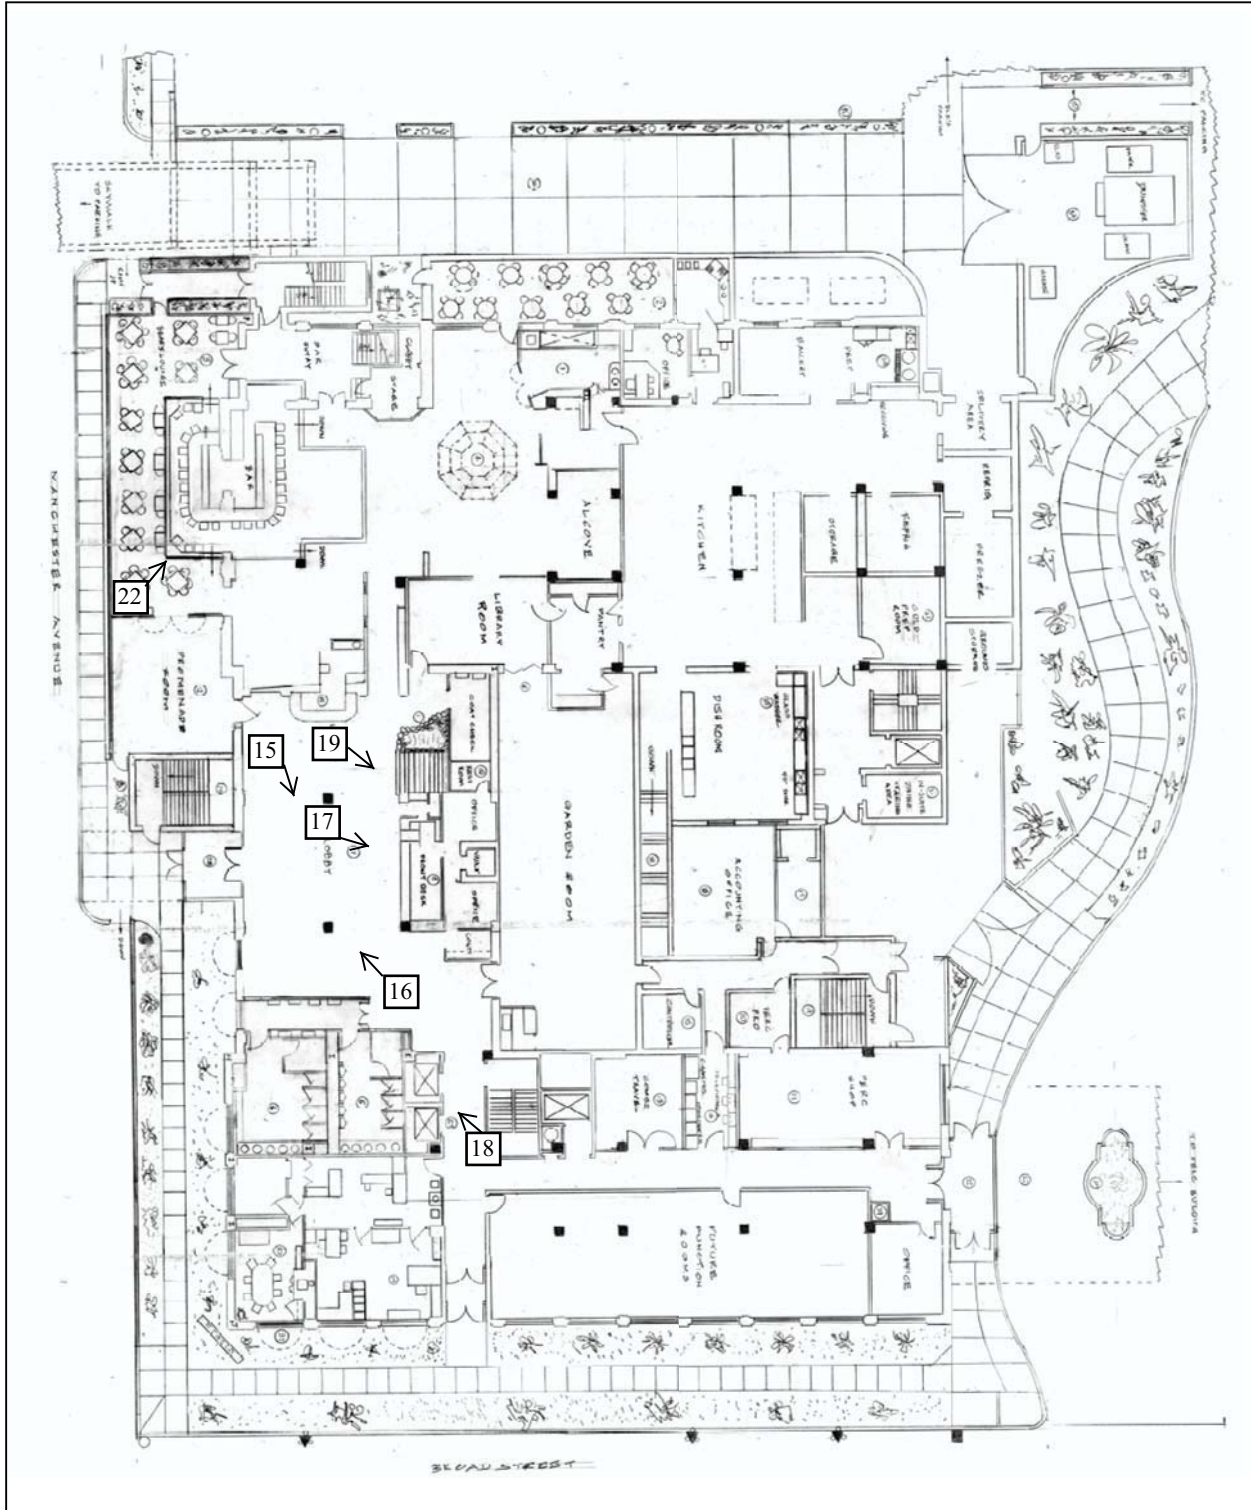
Floor plan of First Floor of the Hotel Manchester in Middletown, Ohio with photo locations
